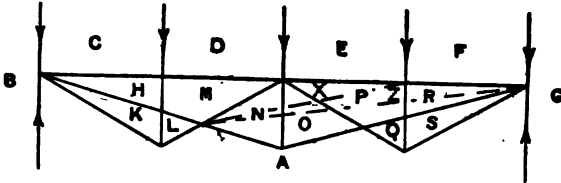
FRAME DIAGRAM, FOR A FINK TRUSS.
